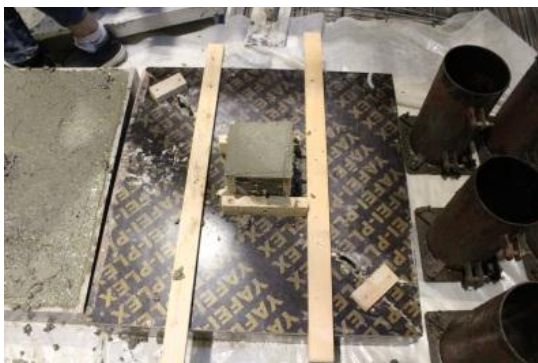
Casting the column stub after placing a plywood piece above the cast slab
